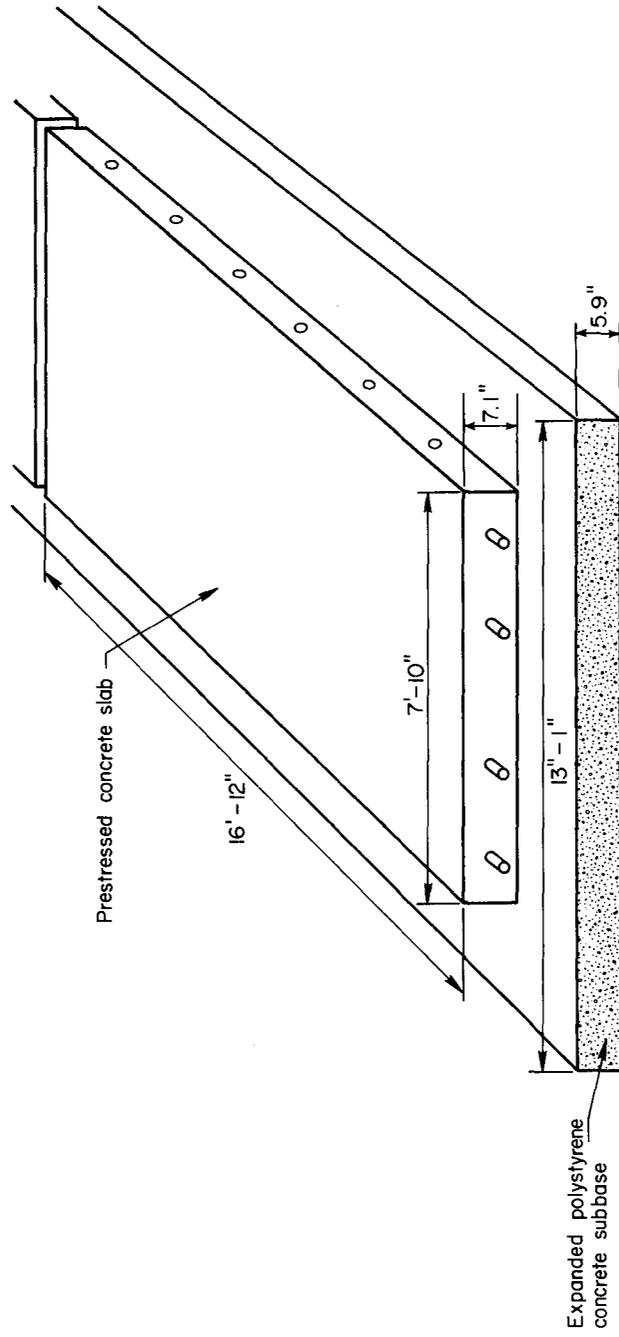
PRECAST CONCRETE SLABS ON EXPANDED POLYSTYRENE CONCRETE SUBBASE AT HIRSCHAID
